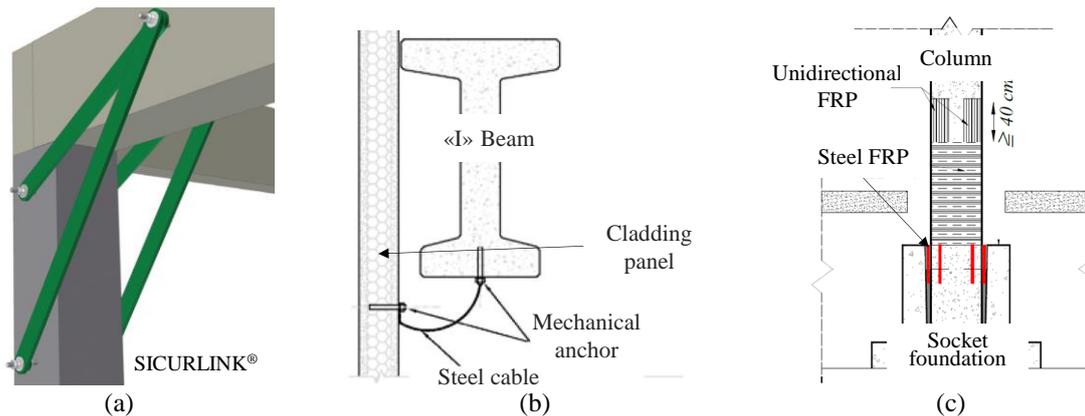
Retrofitting techniques for (a) beam to column connection, (b) cladding panel-to-structure connections and (c) precast column
